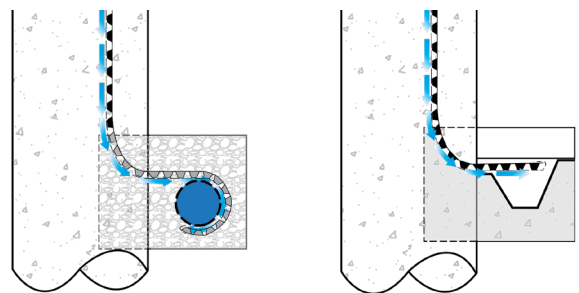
Examples of Piledrain fed into gravel surround to collector pipe, or into a drainage channel cast in the concrete plinth to support a PCC slab.
